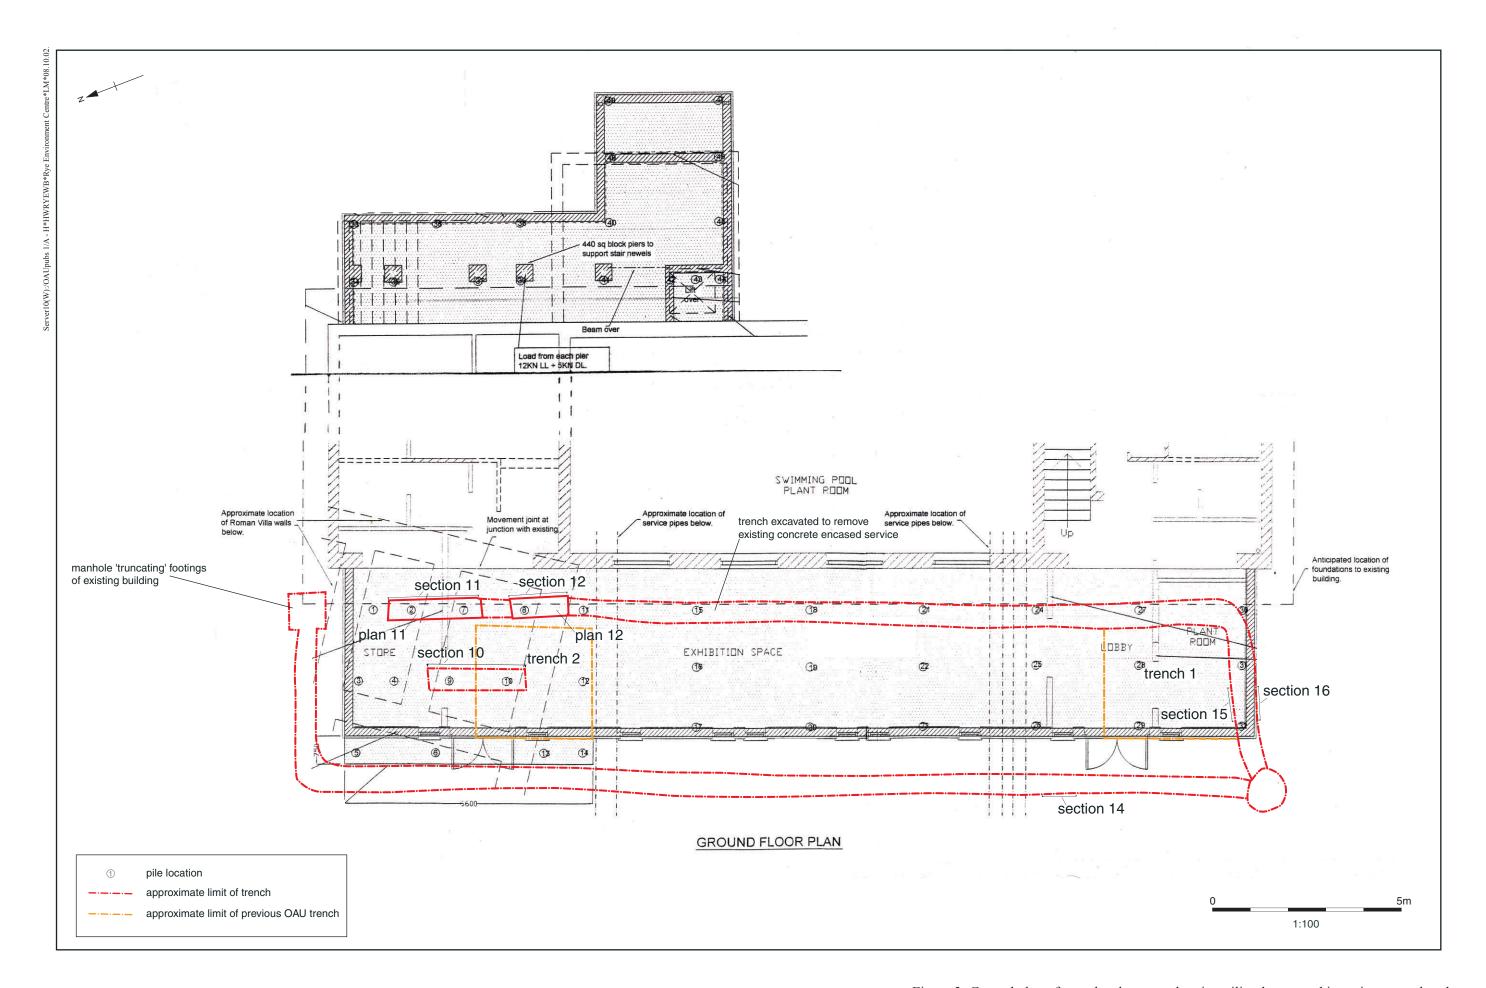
Ground plan of new development showing piling layout and intrusive groundworks
